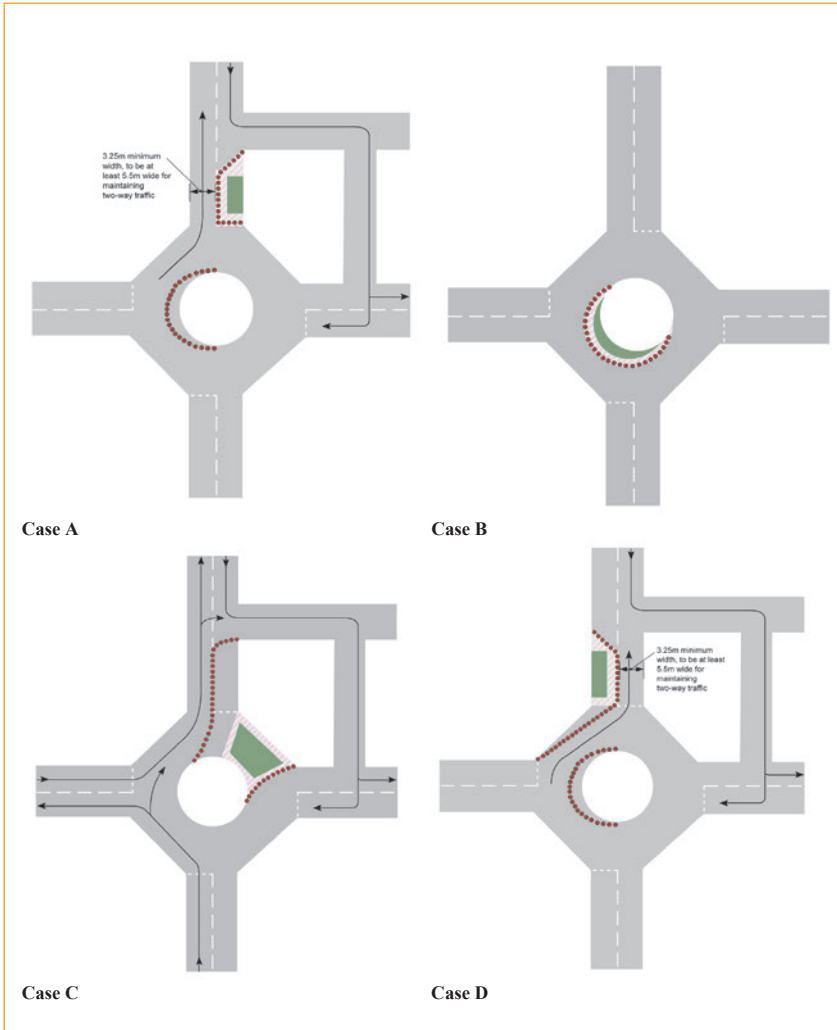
ROAD WORKS AT A ROUNDABOUT (LHS)
